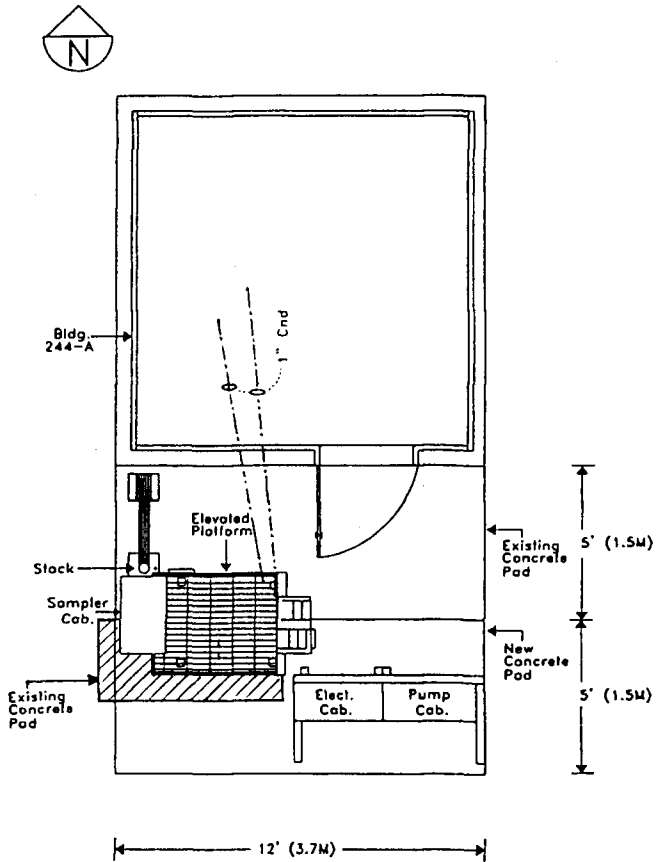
244-A DCRT GEMS Upgrade - Plan View of Equipment Layout
